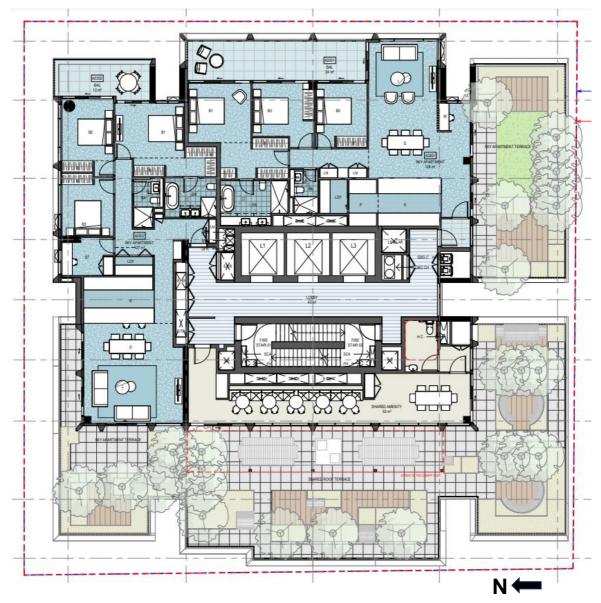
| Level 22 Plan with communal open space (source: Applicant's RtS)
